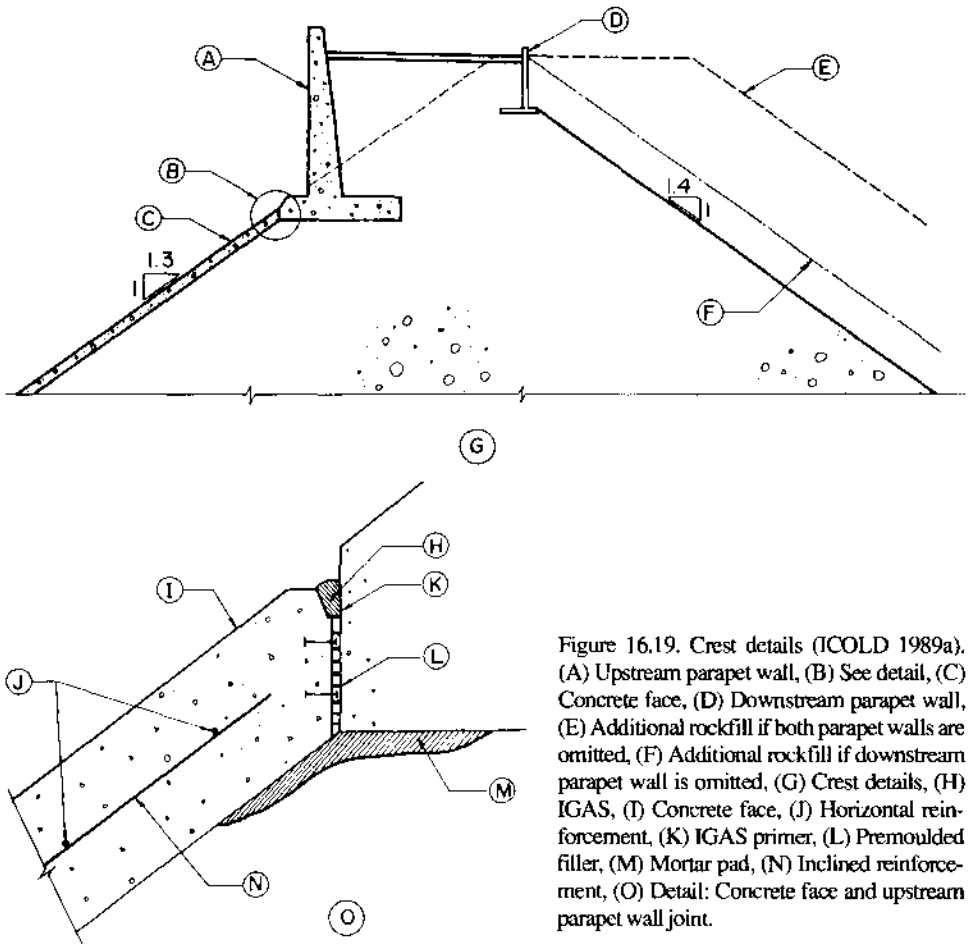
Crest details (ICOLD 1989a). (A) Upstream parapet wall, (B) See detail, (C) Concrete face, (D) Downstream parapet wall, (E) Additional rockfill if both parapet walls are omitted, (F) Additional rockfill if downstream parapet wall is omitted, (G) Crest details, (H) IGAS, (I) Concrete face, (J) Horizontal reinforcement, (K) IGAS primer, (L) Premoulded filler, (M) Mortar pad, (N) Inclined reinforcement, (O) Detail: Concrete face and upstream parapet wall joint.
